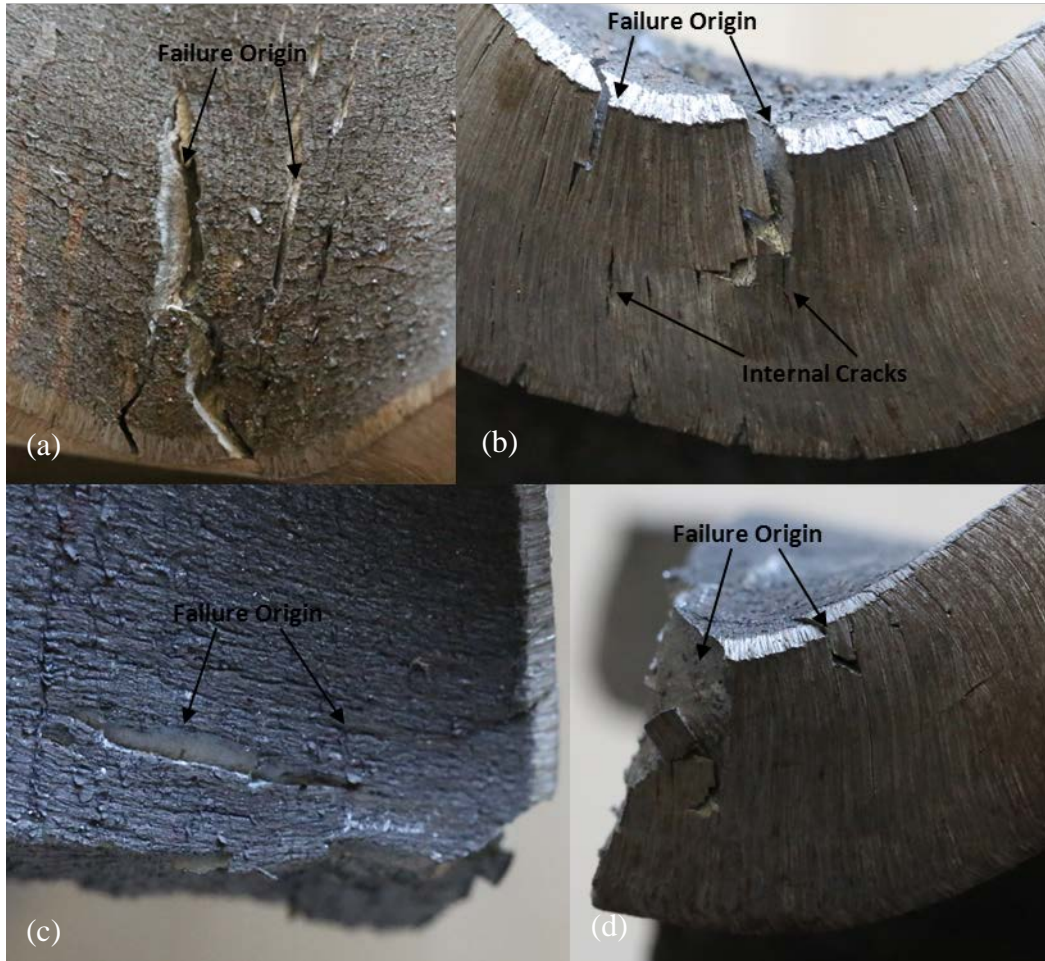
Visible Notches and Internal Cracking at the Flange Tip and at the Flange Surface near the Flange Tip at Two Different Locations. (a) Surface View (b) and Side View of the Bottom Flange with Crack Initiation. (c) Surface View (d) and Side View of the Bottom Flange near the Fractured Area.
